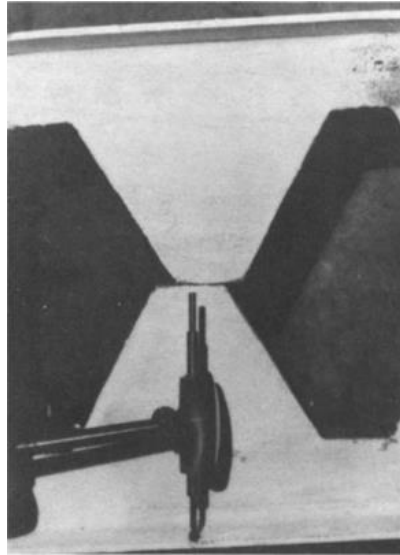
Rupture of a welded joint in a web post [45]
